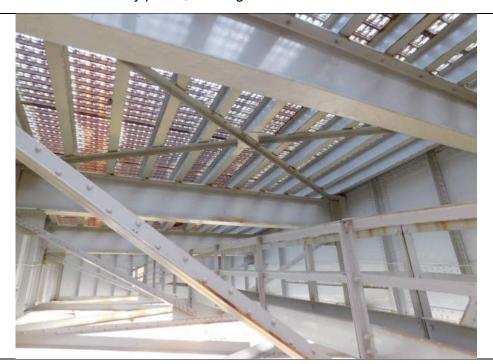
[Span 5, South Leaf] -Stringers, floorbeams, bracing and catwalk between G2W-G3W and FB5s-6s-7s, general view of paint in good condition, Looking North
